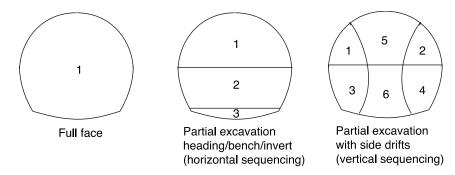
Typical excavation sequencing types in conventional tunnelling. Source: (ITA, 2009)
